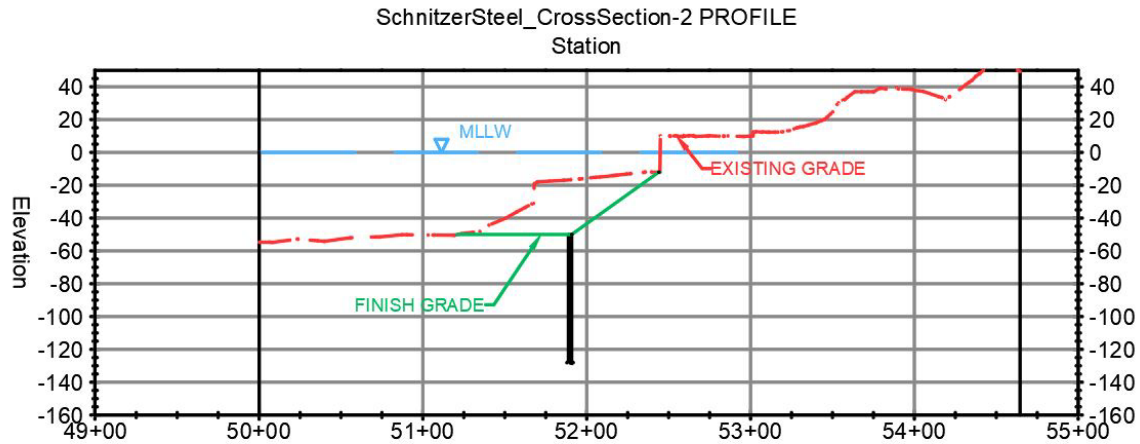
Schnitzer Steel Proposed Design Typical Cross Section
